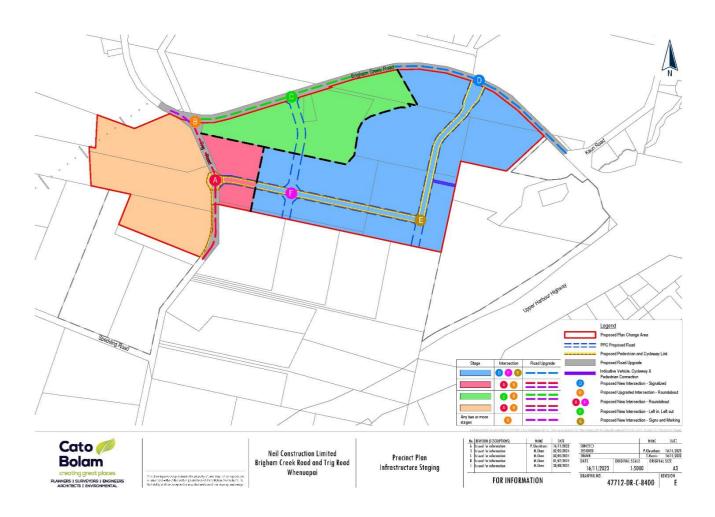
Infrastructure Staging Plan (Source: Appendix H to the Plan Change Request)
